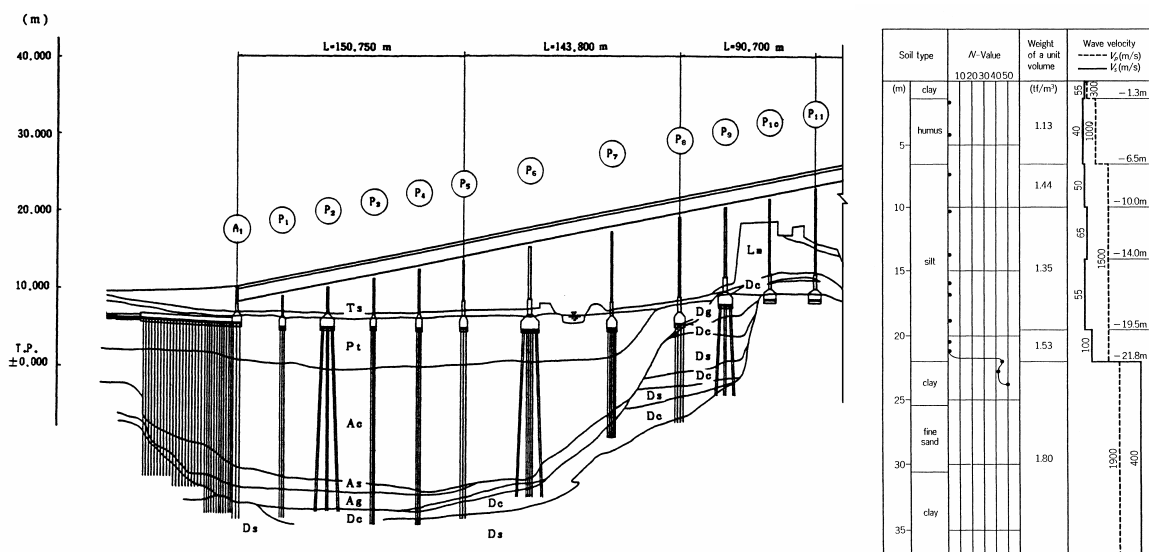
Bridge Elevation and Soil Conditions [after Ohira et al. (1984)].
